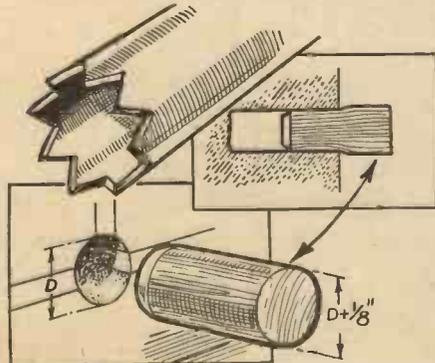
For inserting round plugs, the hole should be cut with a jumper made from a piece of tube, as shown.
